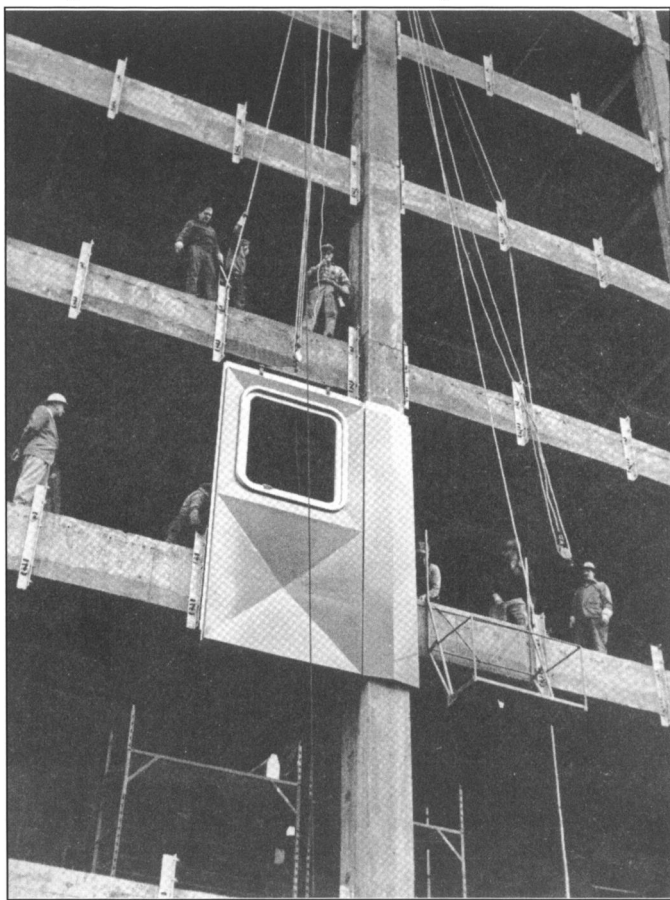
The Alcoa Building, Pittsburgh, under construction (from *Architectural Record* August 1952).
